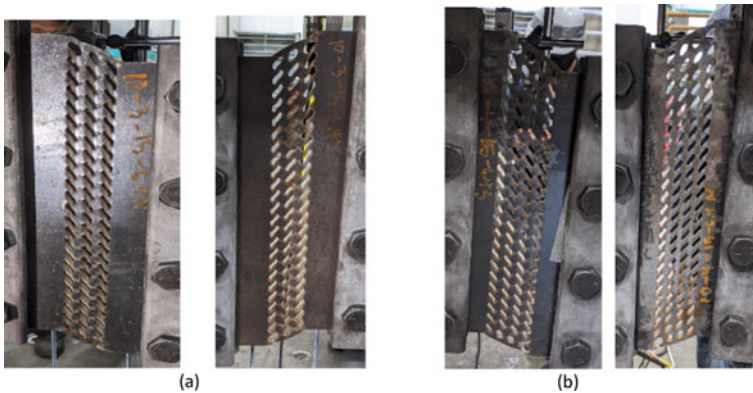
Deformed shapes of south and north specimens in monotonic tests a 10-3-15-6.4M; b 10-4-15-6.4M
